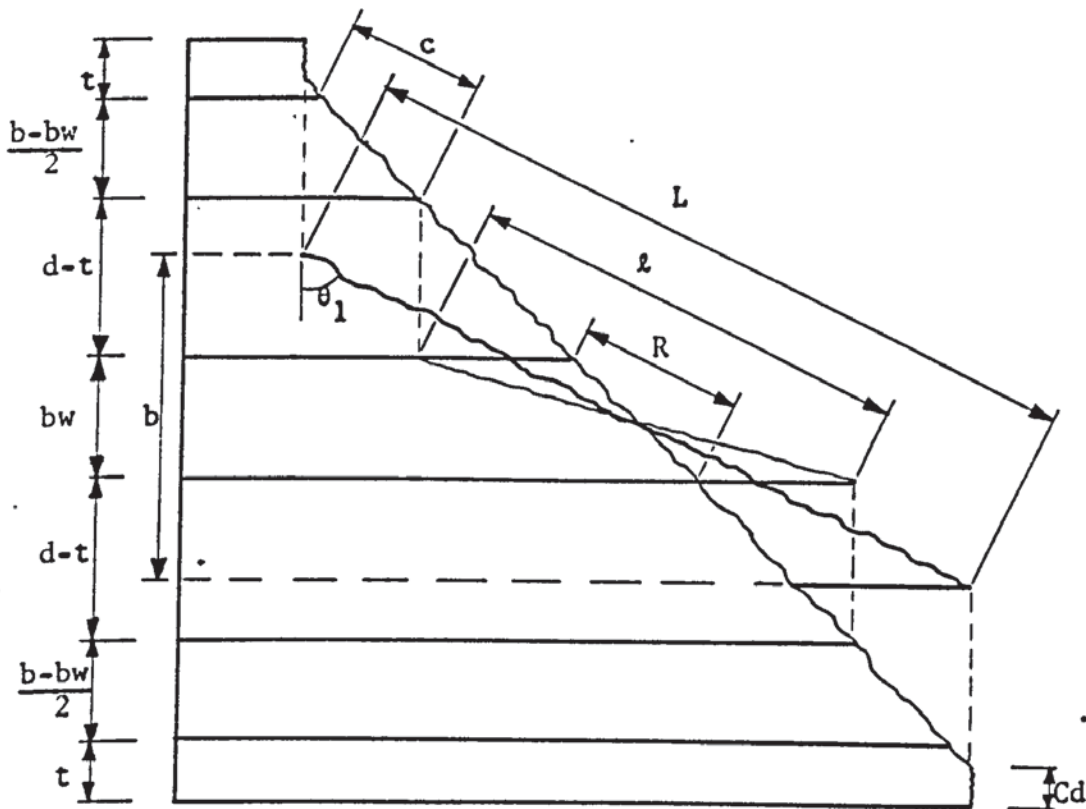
MODE ONE FAILURE IN PLAIN CONCRETE T-MEMBERS - I
